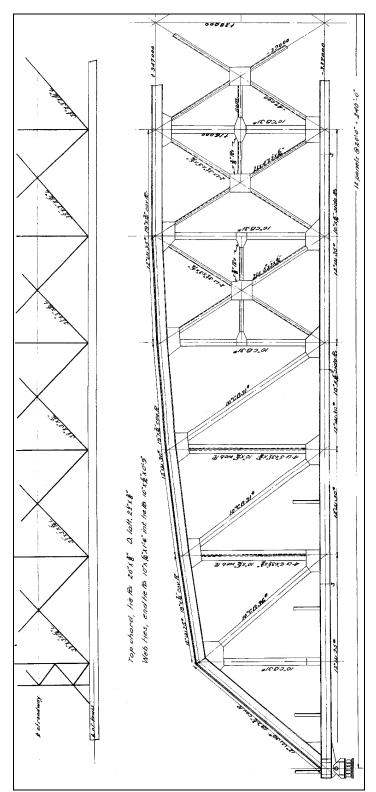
Bridge half-plan and elevation [source: original bridge drawings 1928].
